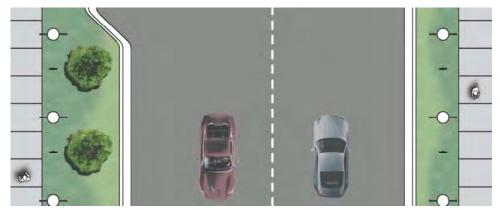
Landscaped bulbouts provide space for additional boulevard treatments.
